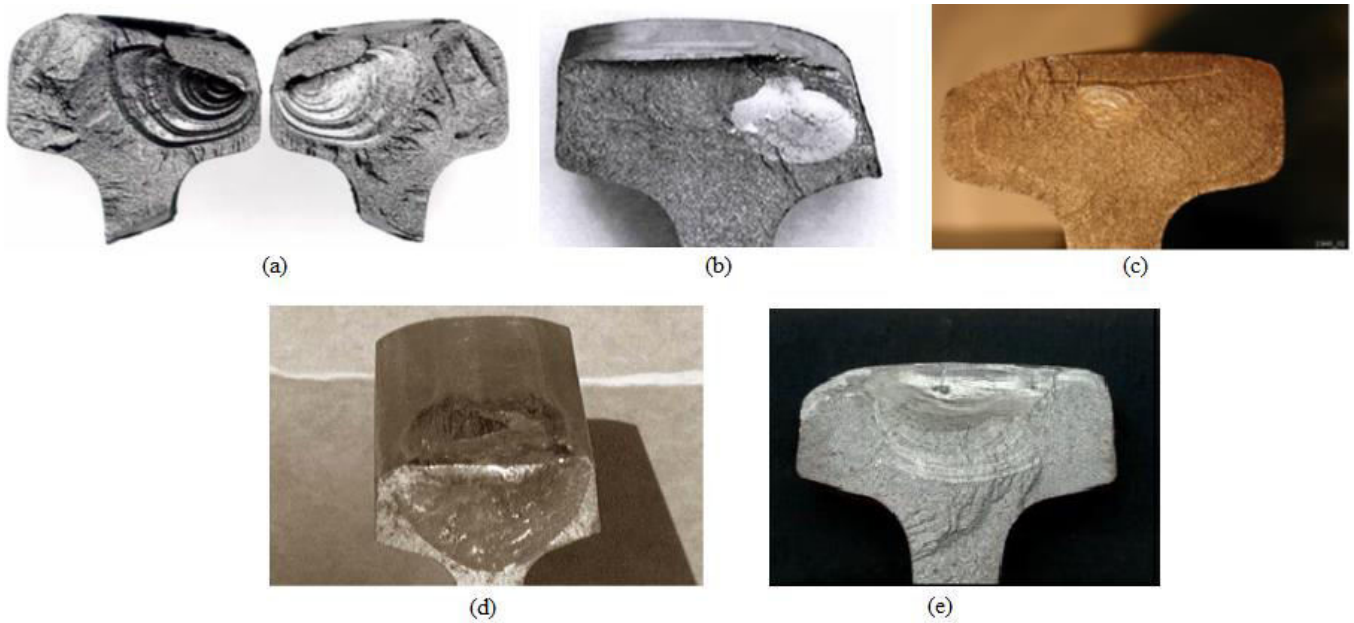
(a) Detail fracture (b) Compound fissure (c) Transverse Fissure (d) Engine burn fracture (e) Welded burn fracture [17]
